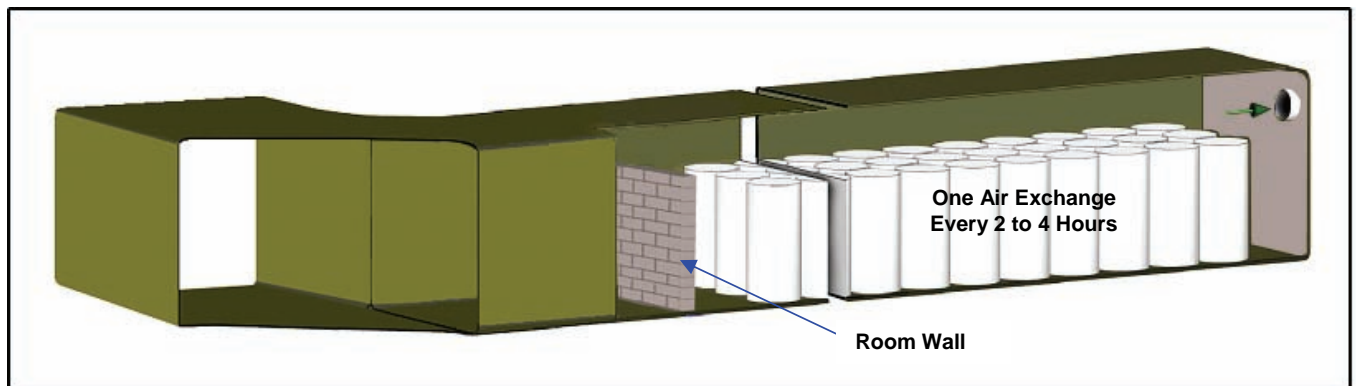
Filled Emplacement Room – Typical ILW and Heavy LLW
